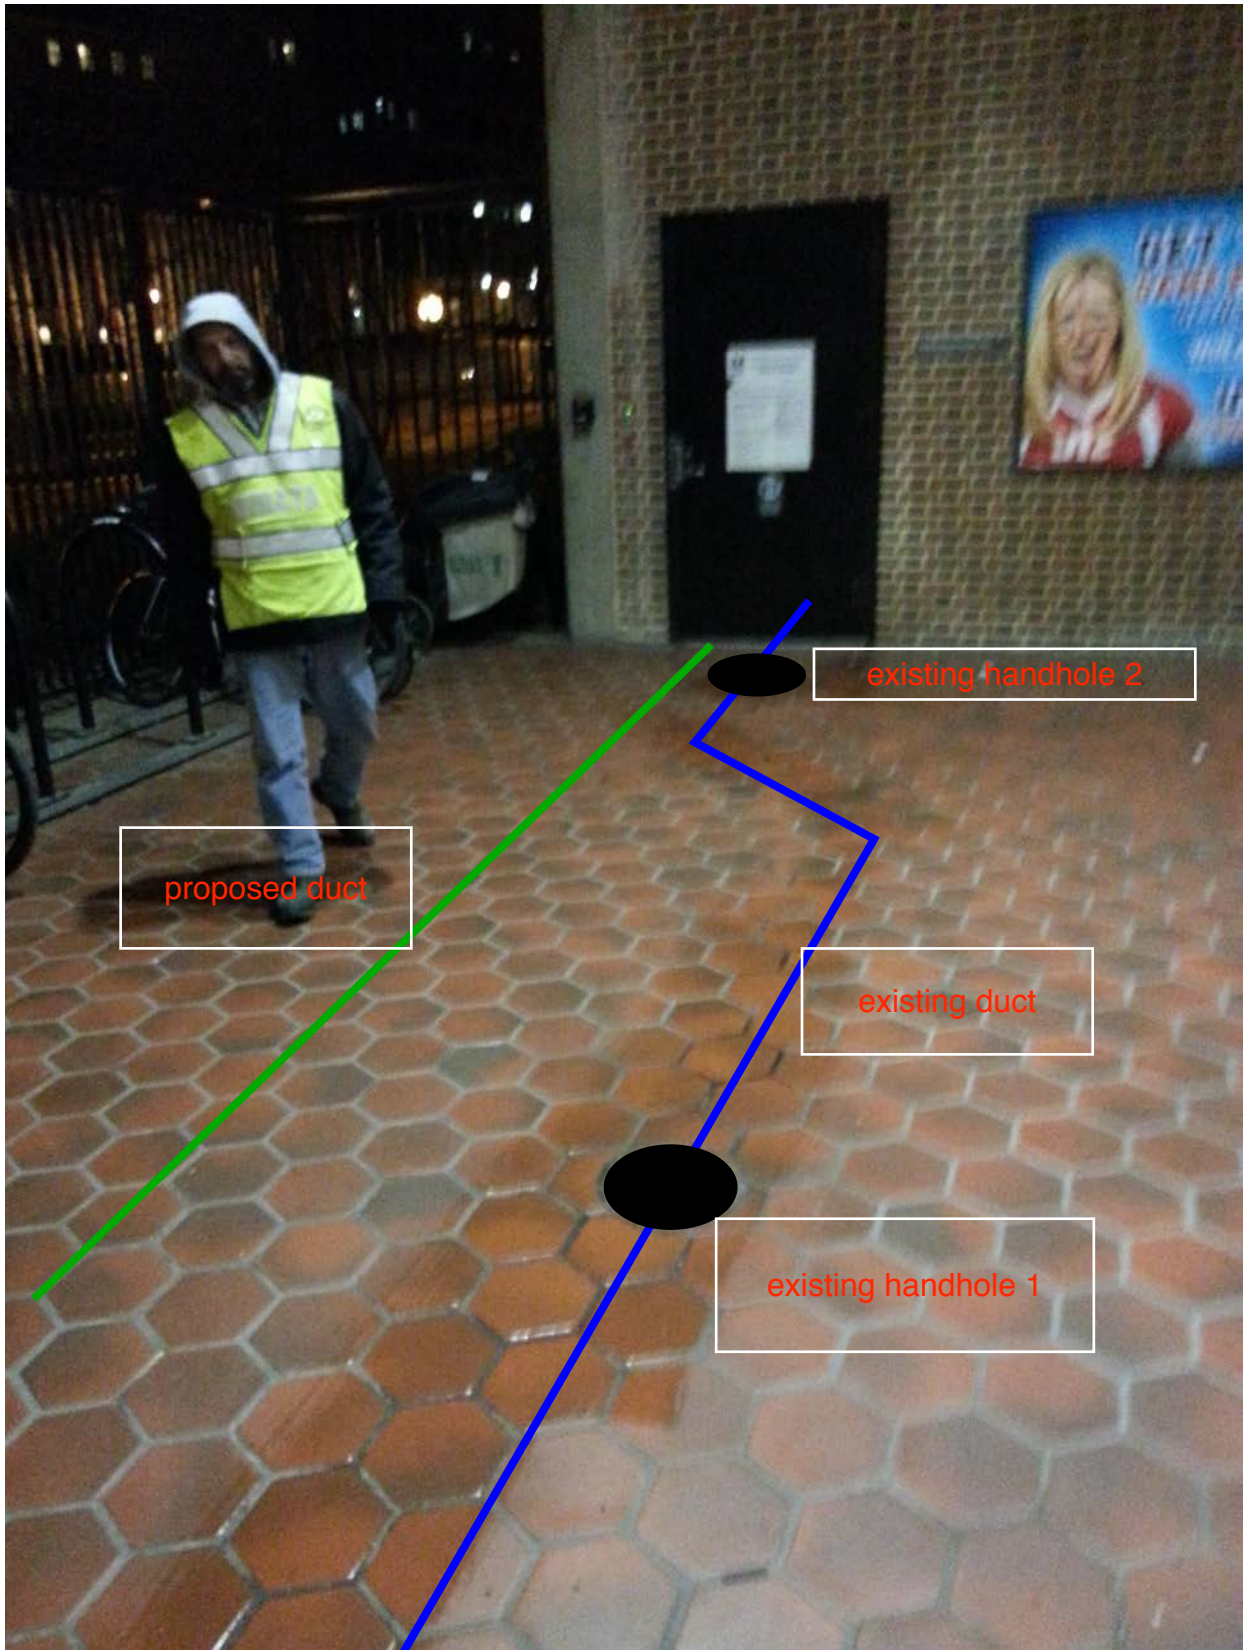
C13 King Street South: Existing duct and proposed duct /conduit transition in back rooms towards AFC panel
